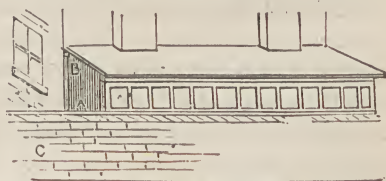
PASSAGE BY SIDE OF HOUSE FOR PLANT, ETC.
